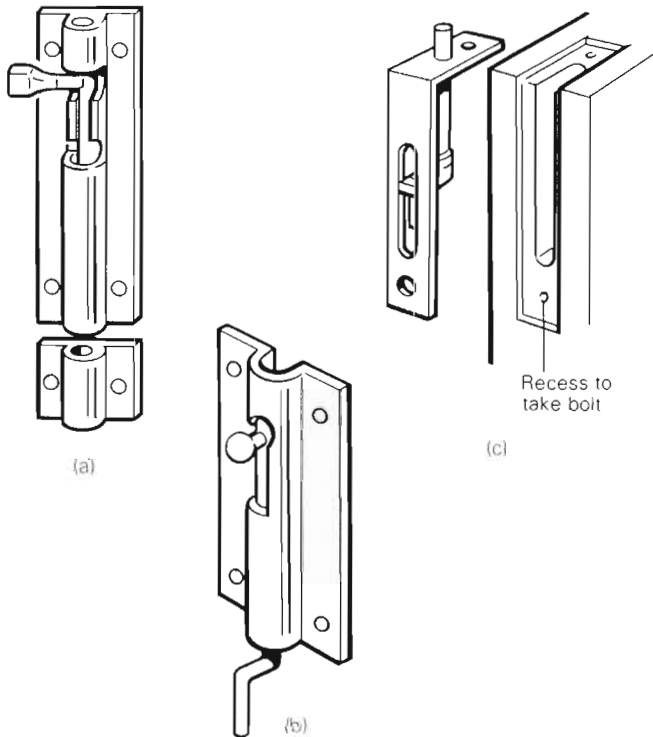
Types of bolt: (a) barrel bolt, (b) offset bolt, (c) flush bolt.
